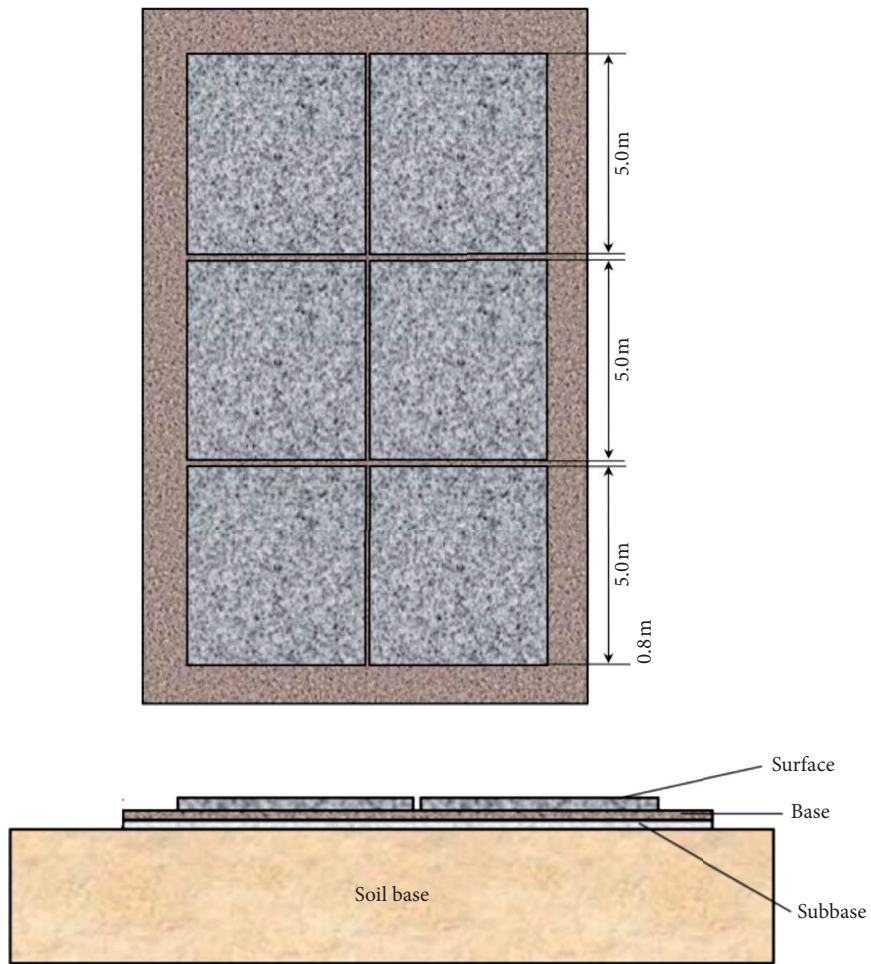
Schematic of full-scale cement concrete pavement structure.
